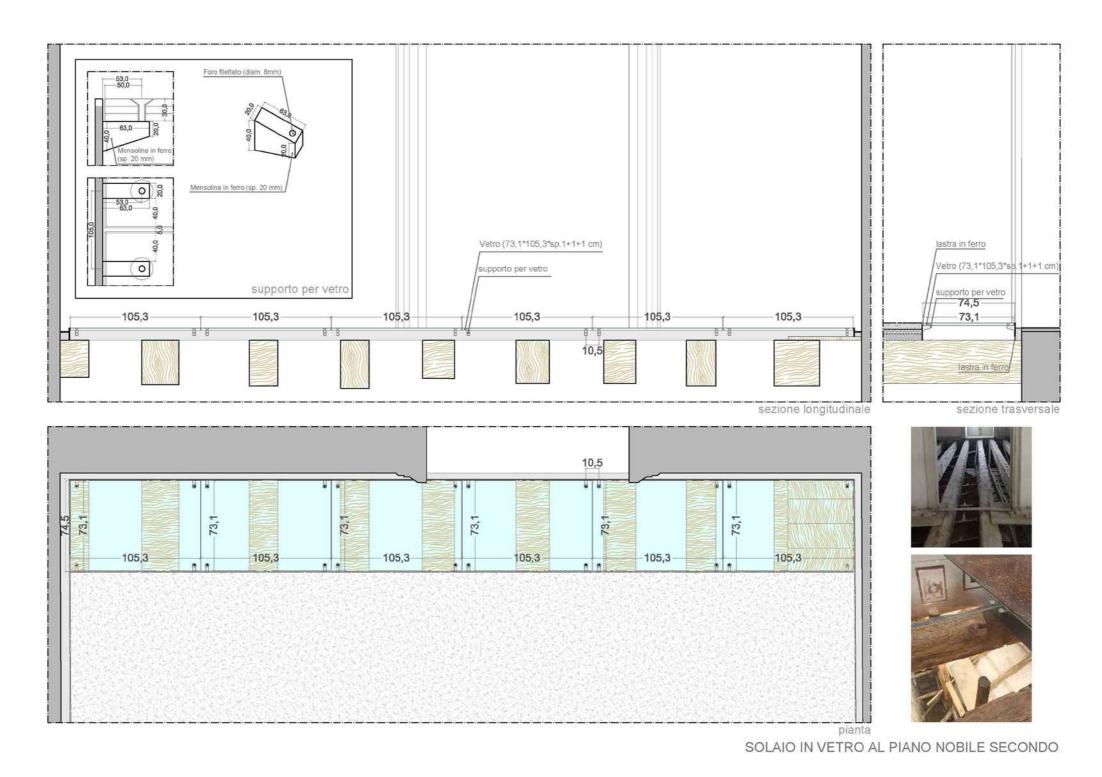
New structural glass floor located at the nobler second floor. © Project Designers
